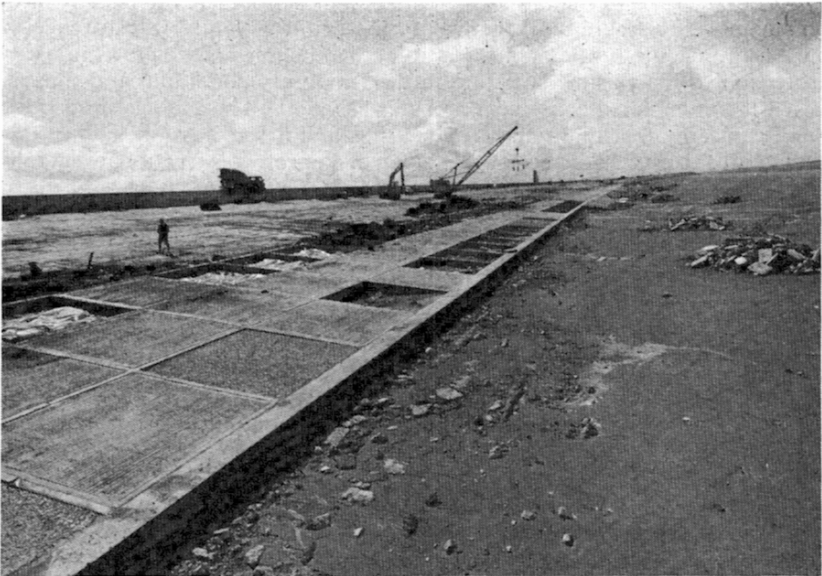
Reconstruction stage I facing under construction showing some unfilled cells in temporarily stable condition (the infill concrete in one of the bottom-row cells has been damaged by sea action and was replaced in due course)
